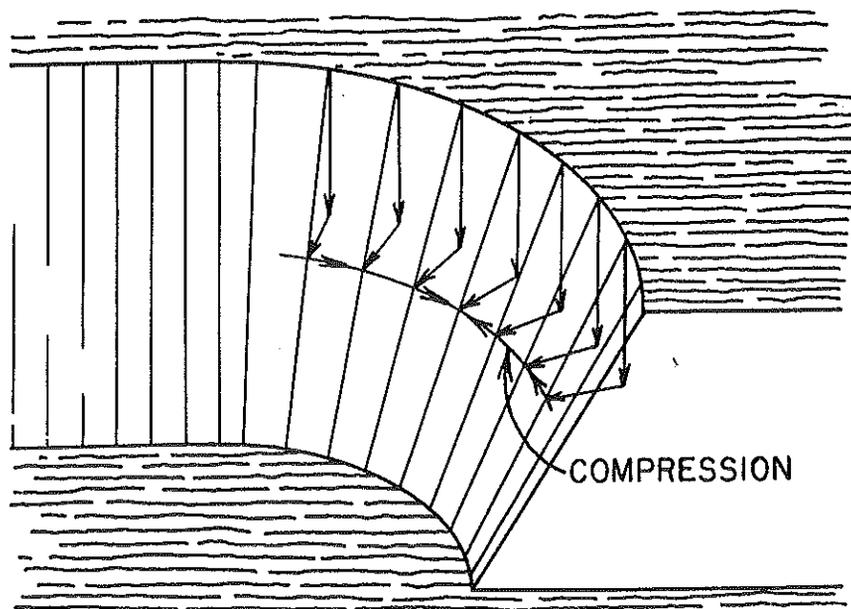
Strengthening effect in a concave-shaped wall of a slope as the result of horizontal tangential stress created by the lateral resultant of the wall burden load.
